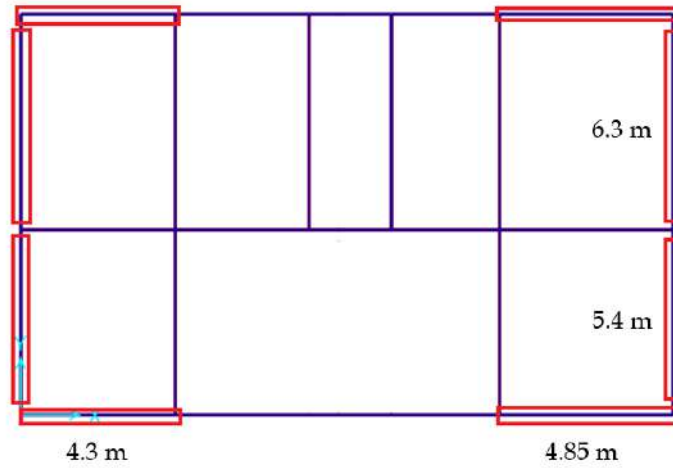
Location of HyBRBs in the retrofitted building in plan
